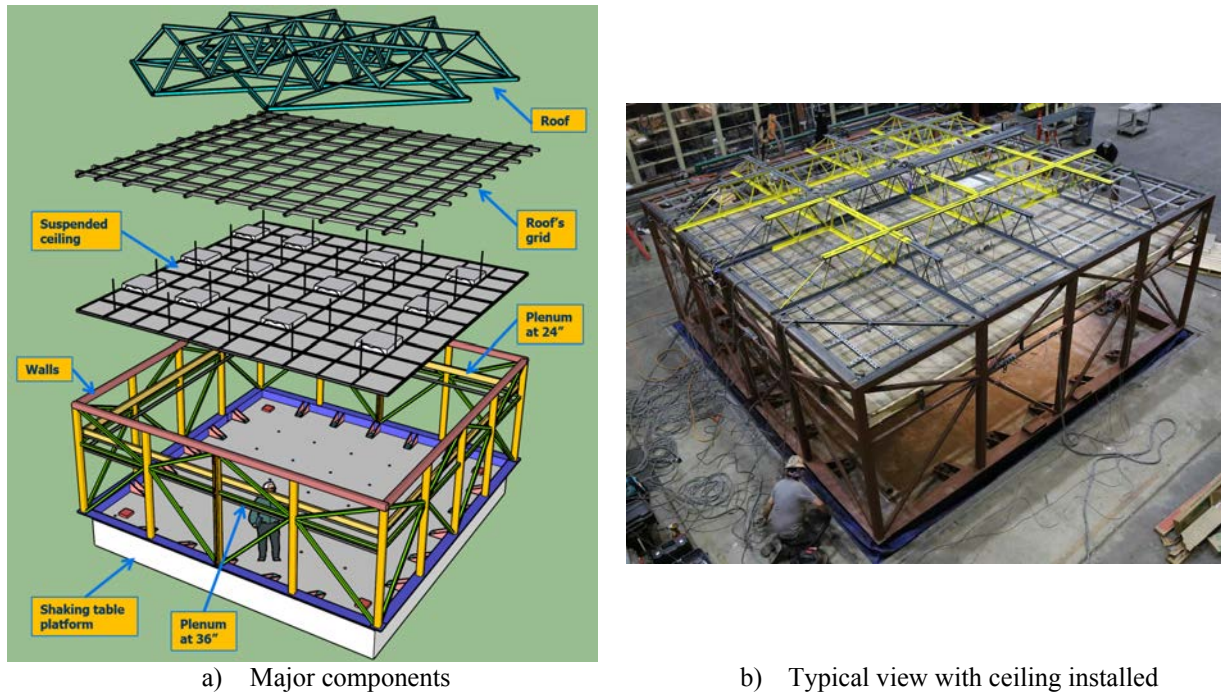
6.1 m by 6.1 m test frame for testing suspended ceiling systems.
